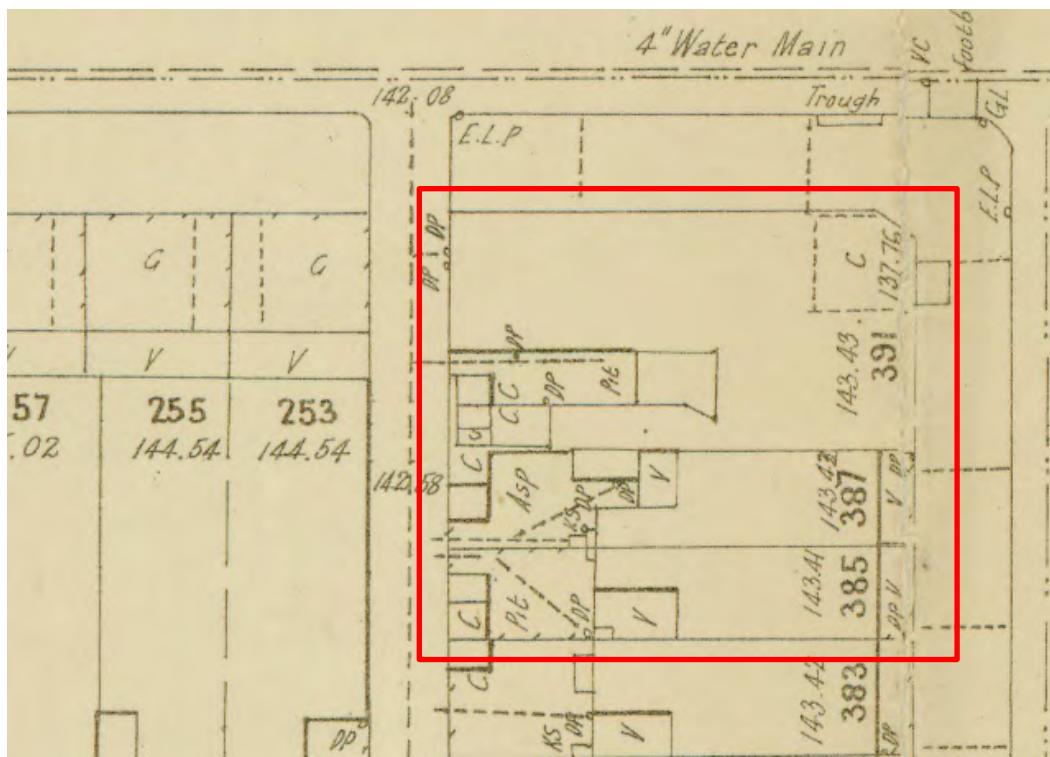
MMBW detail plan no. 1171, 1897, with hotel and houses in subject site indicated
